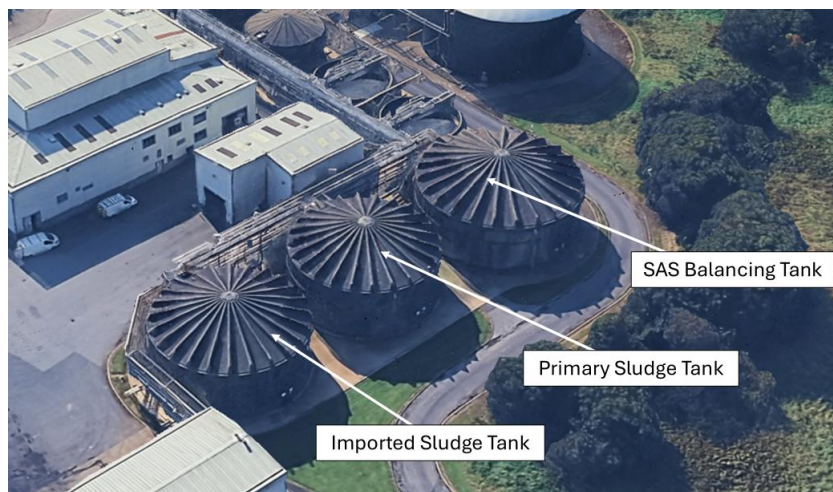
EXISTING SLUDGE HOLDING TANKS
